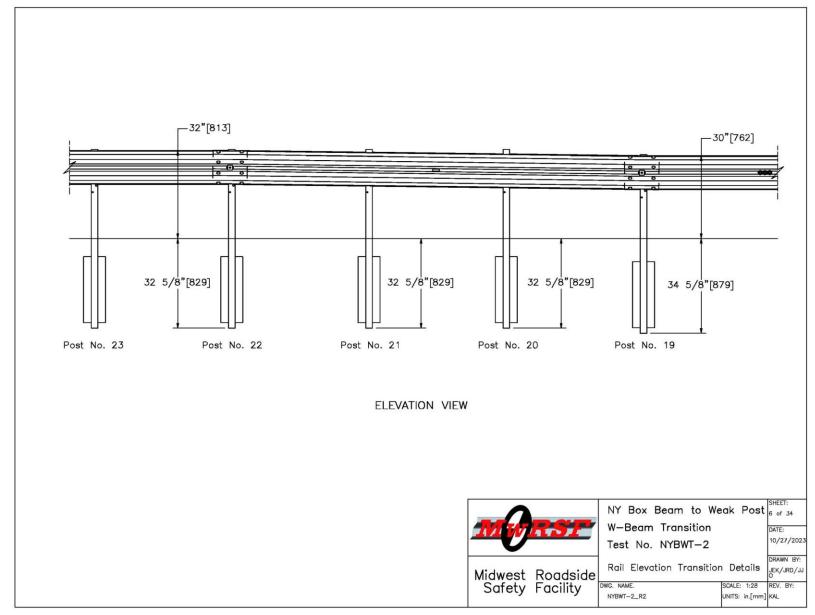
Rail Elevation Transition Details, Test No. NYBWT-2
